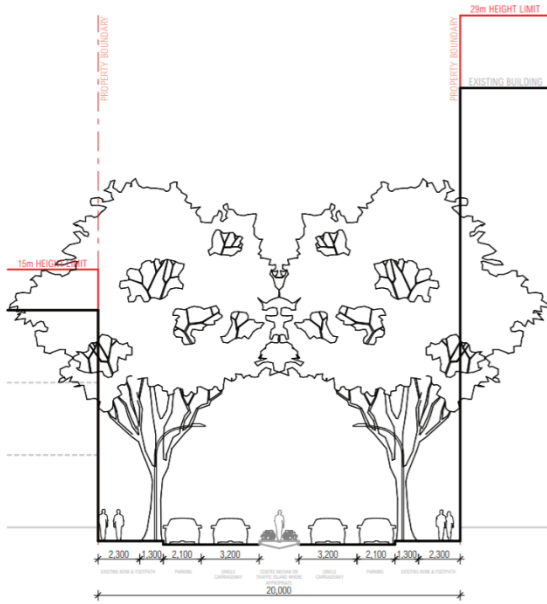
Indicative street section – Typical heritage conservation area street, North Alexandria
